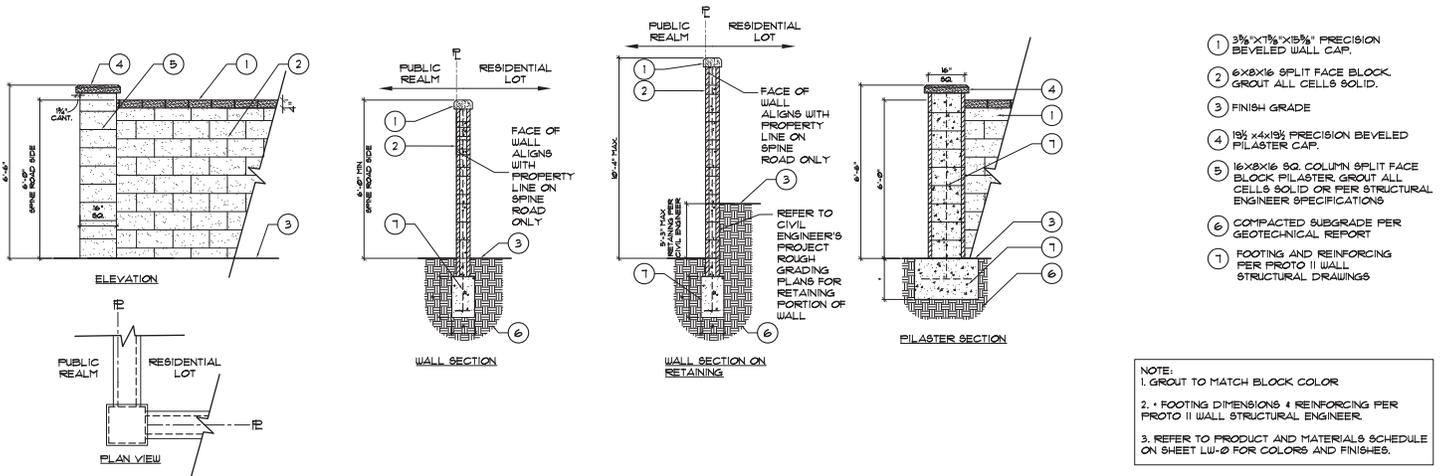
6'-0" Min. Proto II Block Wall or Equal
